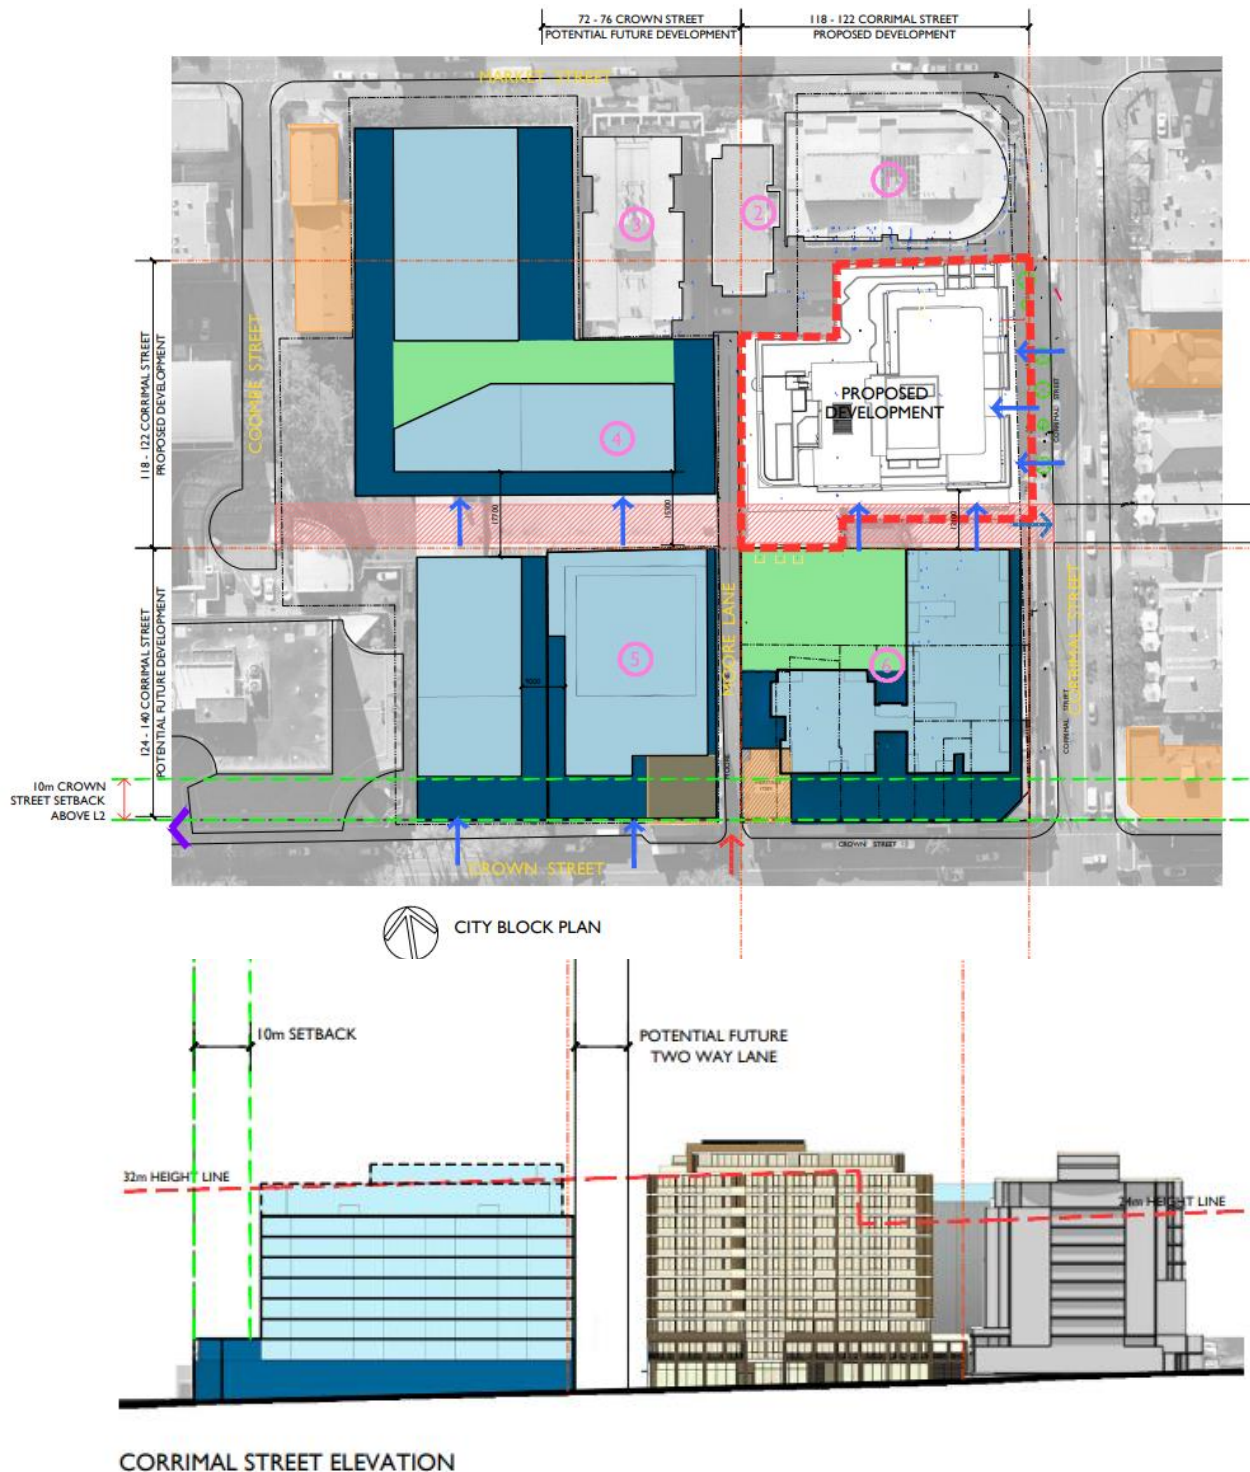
Extract of Built Form Study prepared by ADM Architects showing separation to possible future buildings
